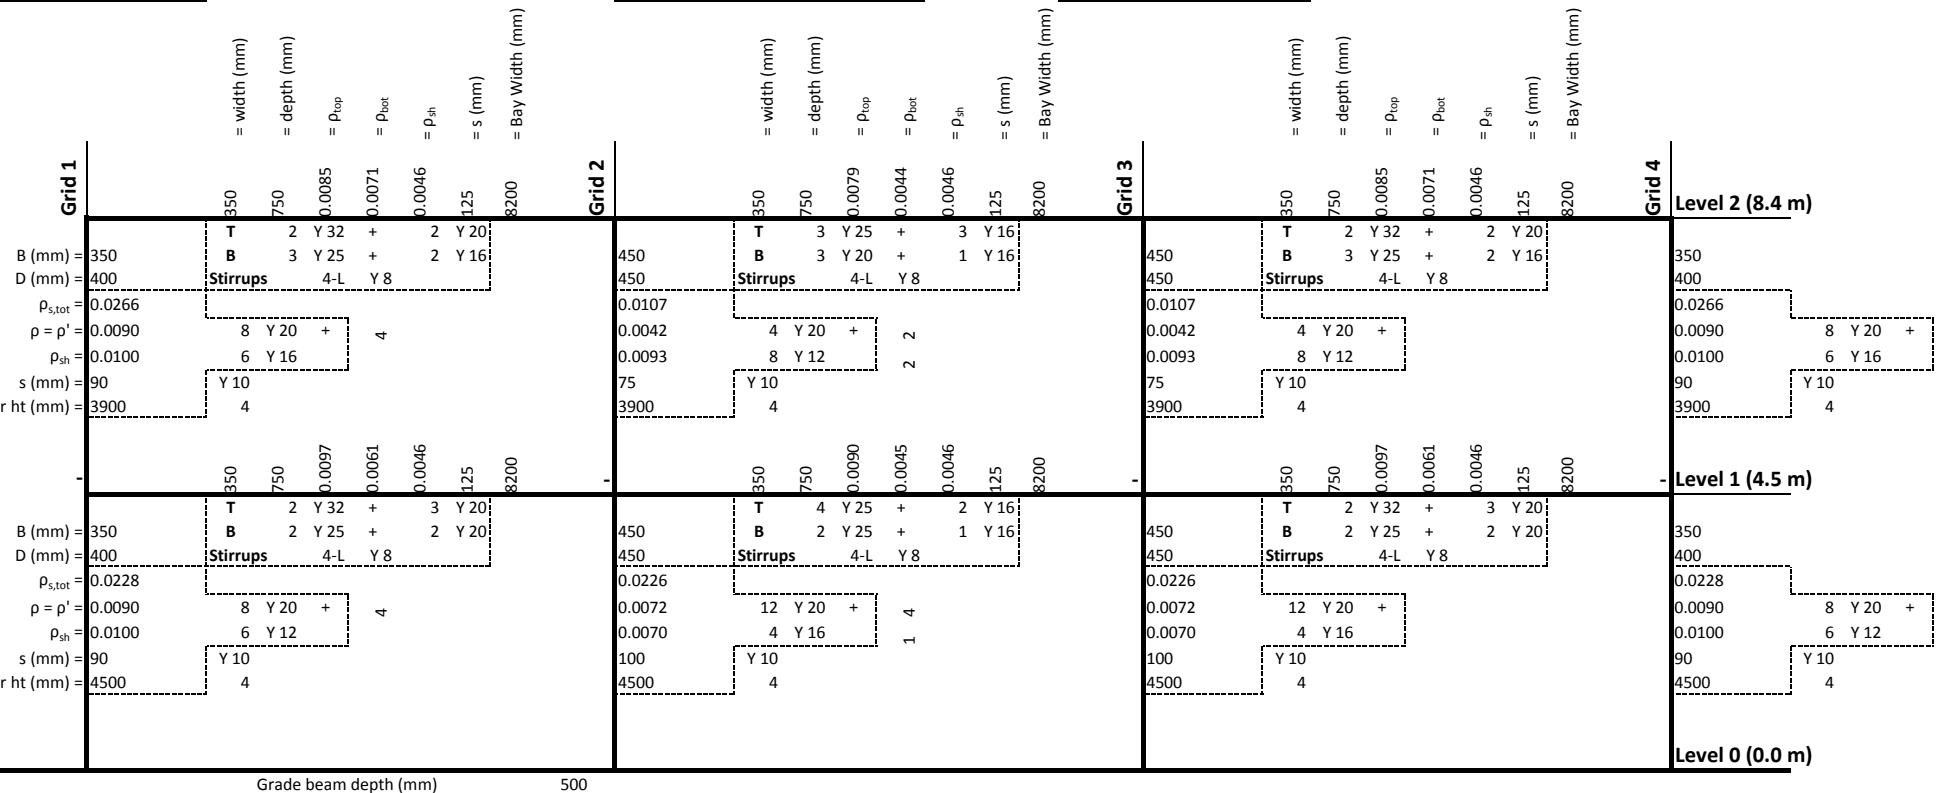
Provided reinforcement and modeling details for building ID 2211
